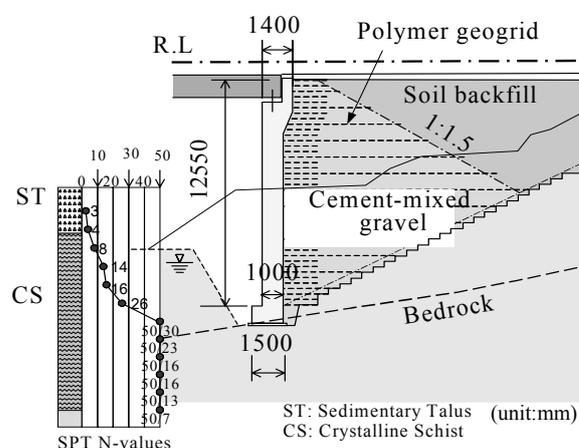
Typical bridge abutment with geogrid-reinforced backfill of cement mixed gravel for a bullet train railway in Kyushu, Japan
